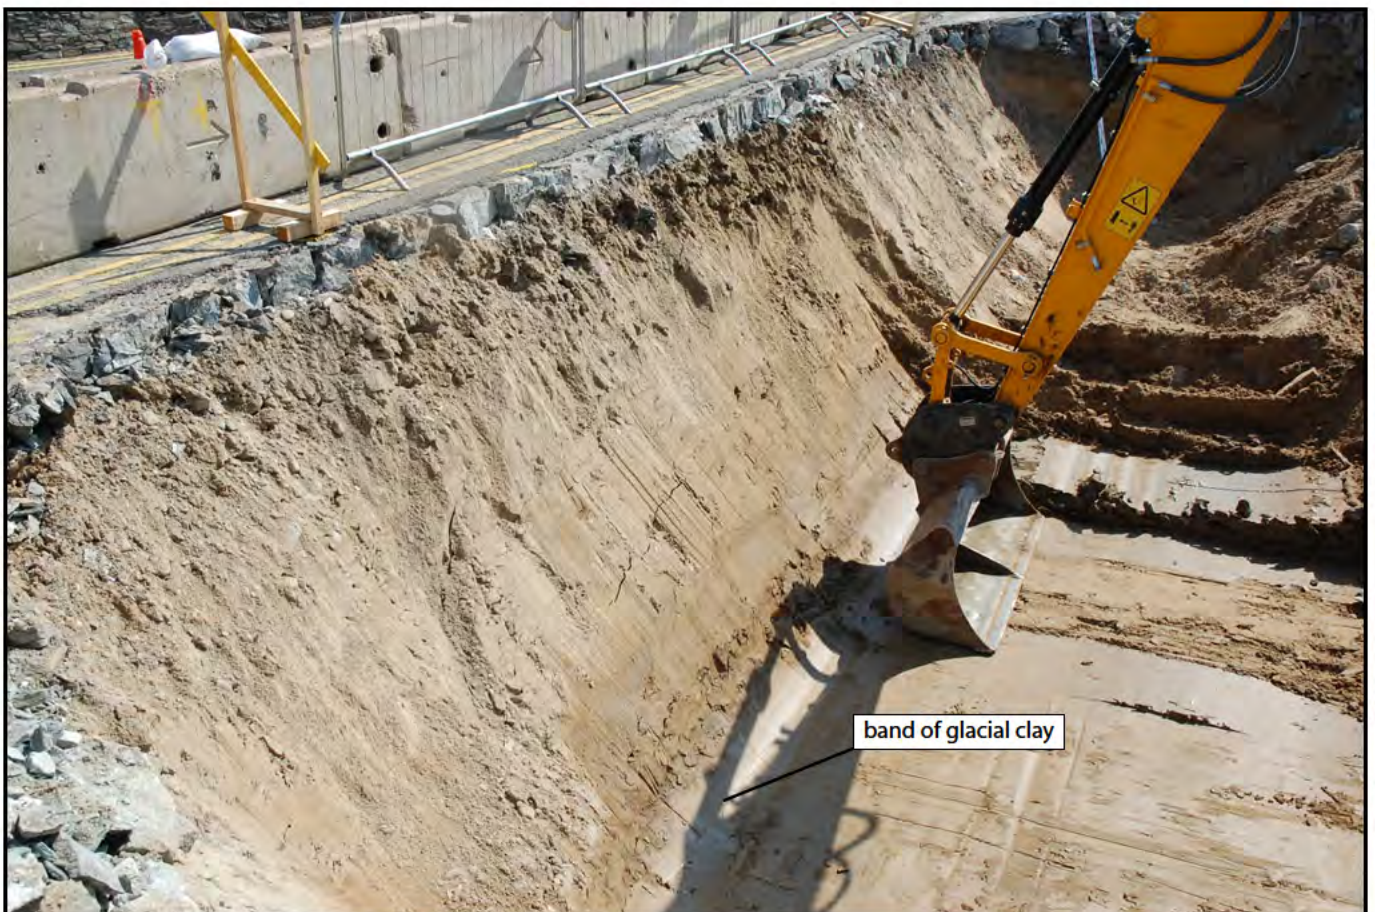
Ravenspoint Road - excavation of existing sea wall foundation levels and beach sand detailing full excavation depth (2.0m); glacial clay was identified at the limit of excavation
